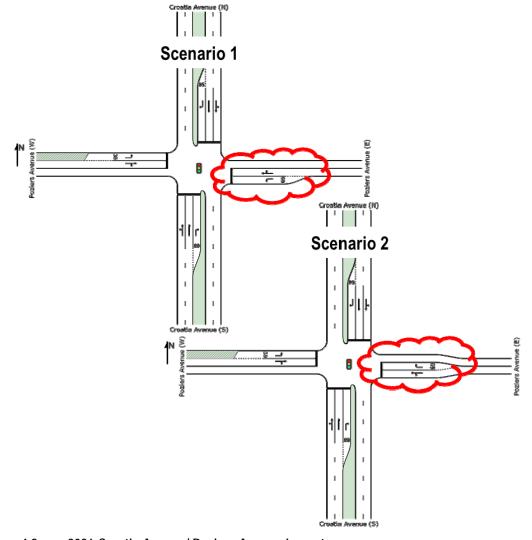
2036 Croatia Avenue/ Poziers Avenue Layout
